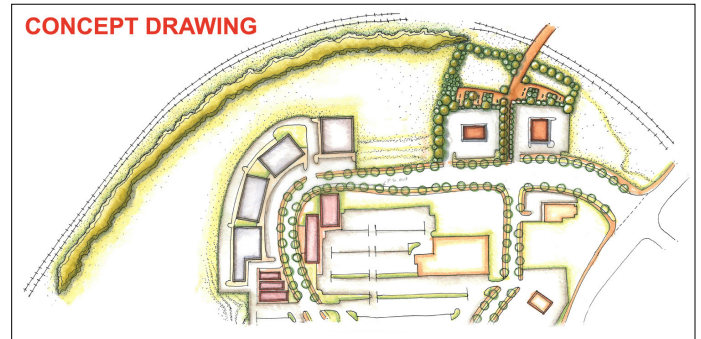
Concept drawing showing possible park at foot bridge and tree buffer along railroad
